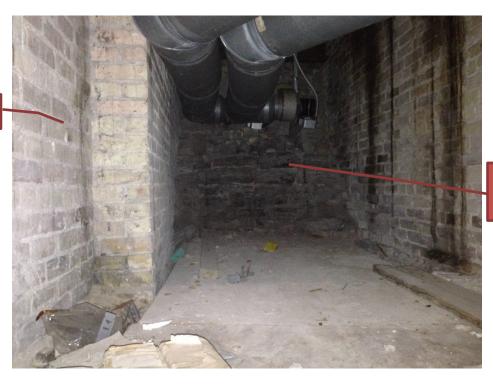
Gap (1.25 feet) between brick cribs and floor slab.
